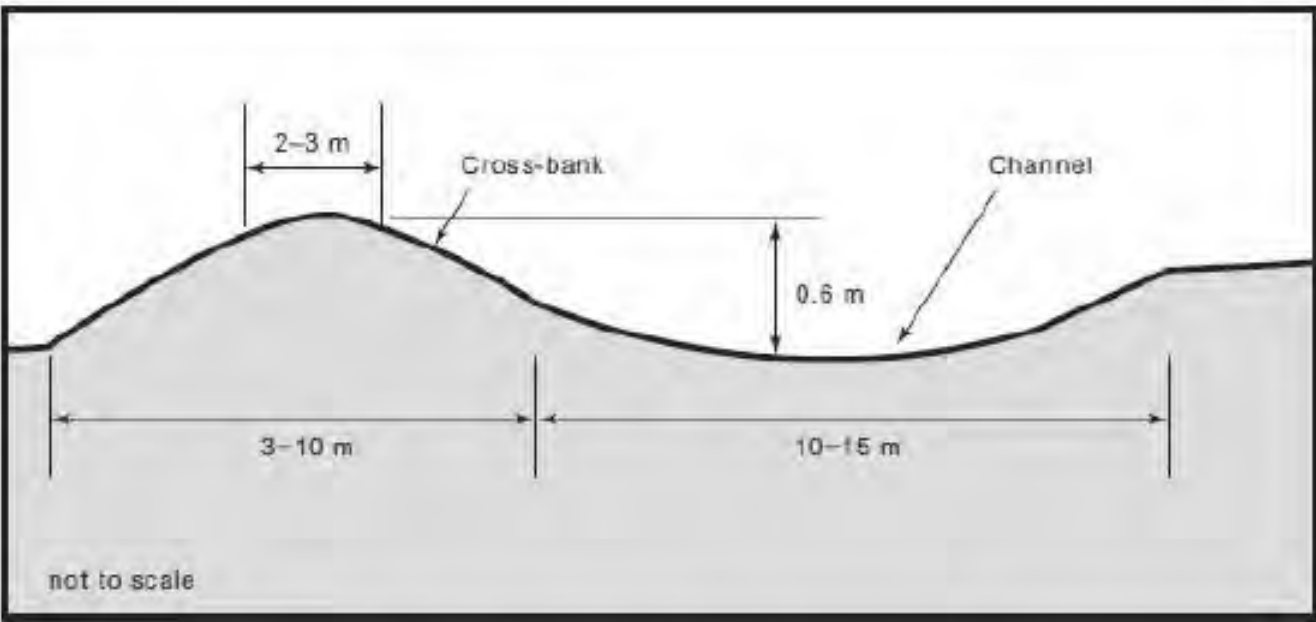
Typical Cross Bank – Cross Section (DECC 2008, modified from Beatty 1995)
